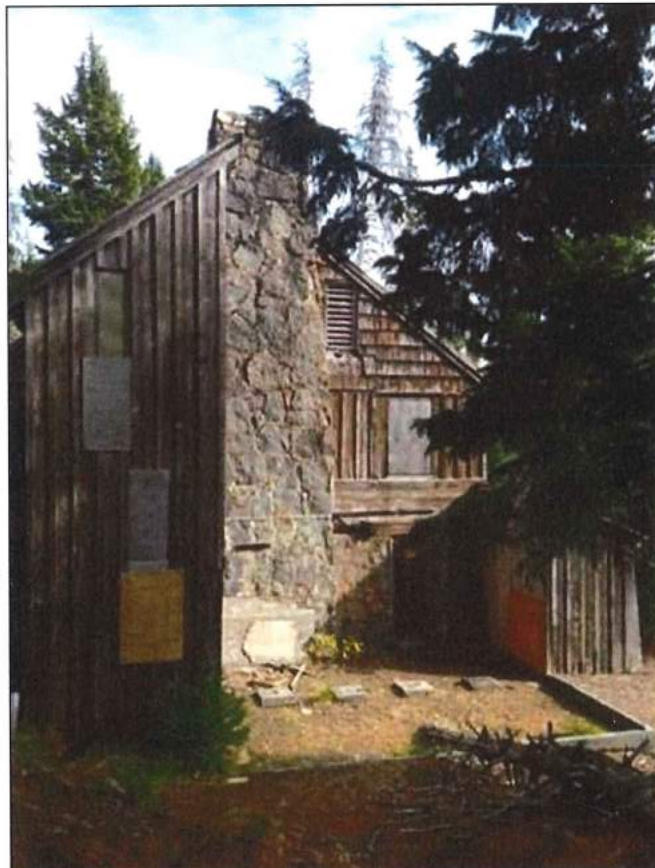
of 10: Main Lodge south side of west elevation. Projecting built additions and foundation (fire escape-left, walkway-right) and original CCC construction visible.
